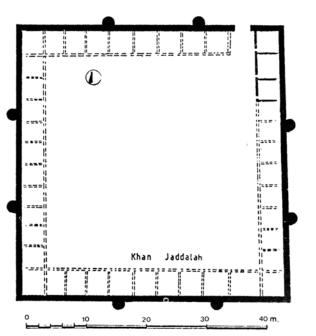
Plan of Khirbet Jaddalah c (IBRAHIM 1986, 269, pl. 21).
